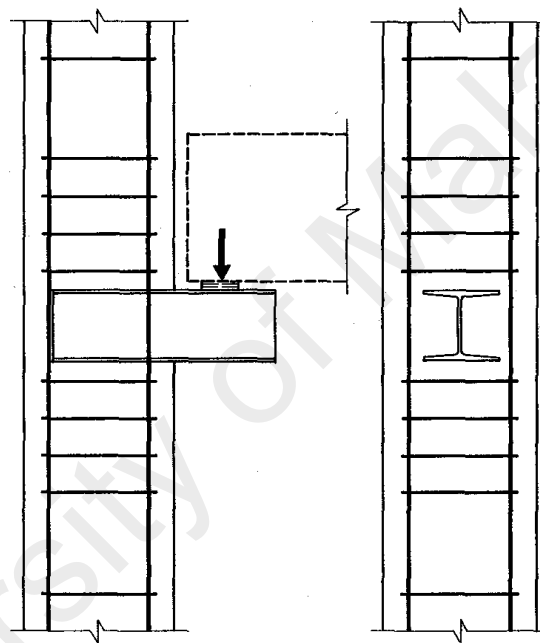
The application of embedded structural steel in precast beam to column connection (Marcakis and Mitchell, 1980)
